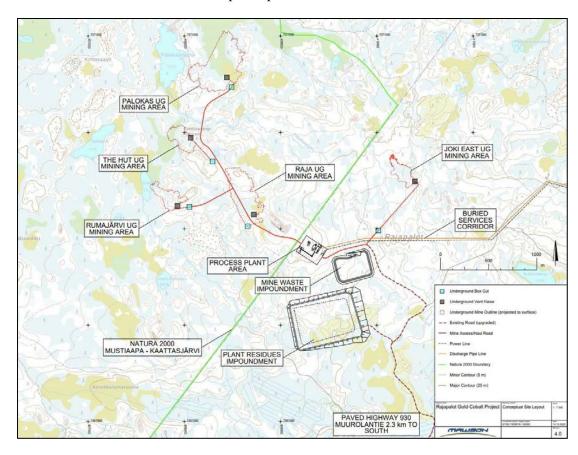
PEA plan view of the Rajapalot deposits and site layout
